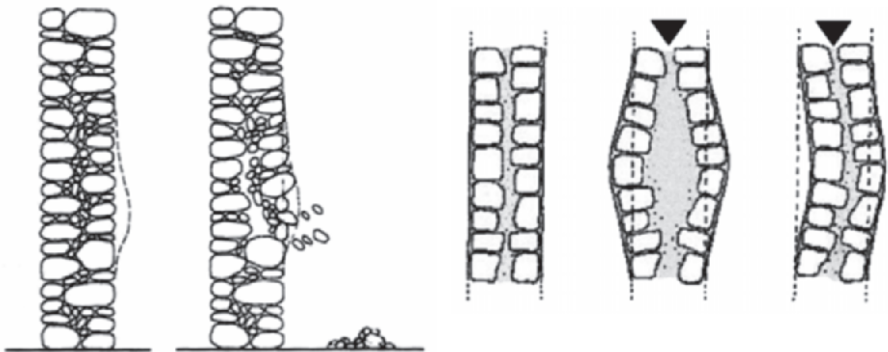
Deformation and failure of a two leaves wall (Giuffrè, 1993).
